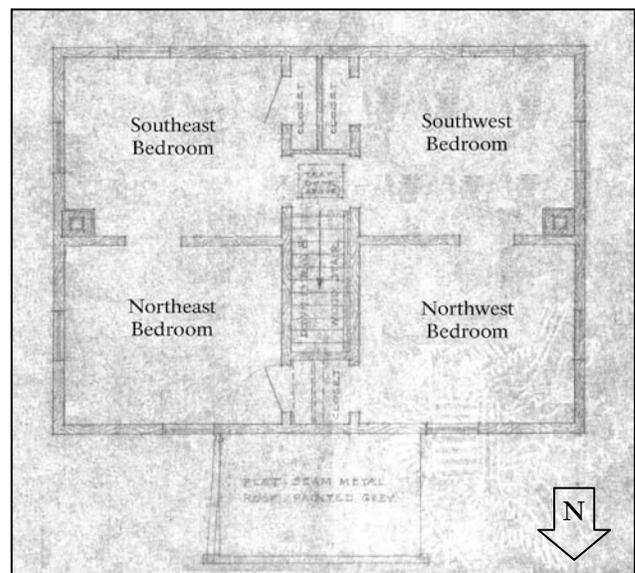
Gray Cottage, conjectural historic plan of second story, depicting a common hallway and staircase with separate bedrooms.
